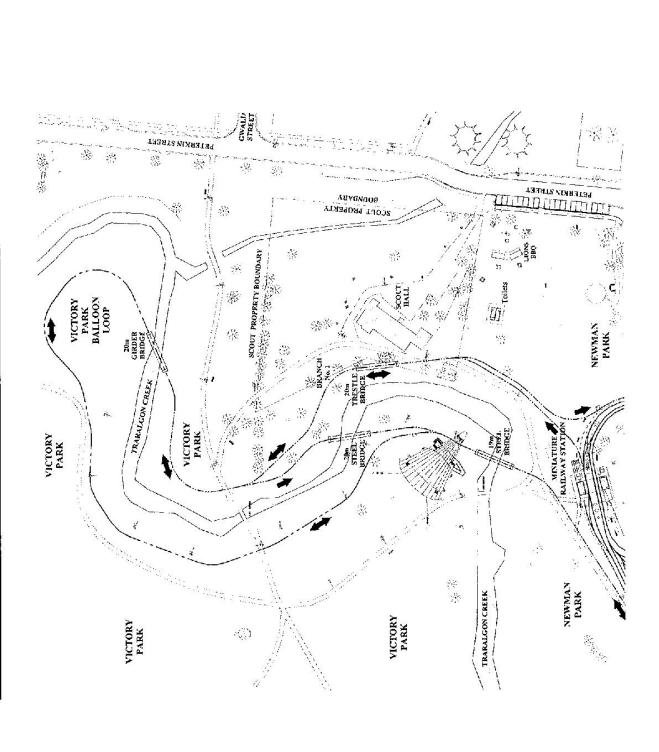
Proposed Victory Park Branch Miniature Railway Extension
